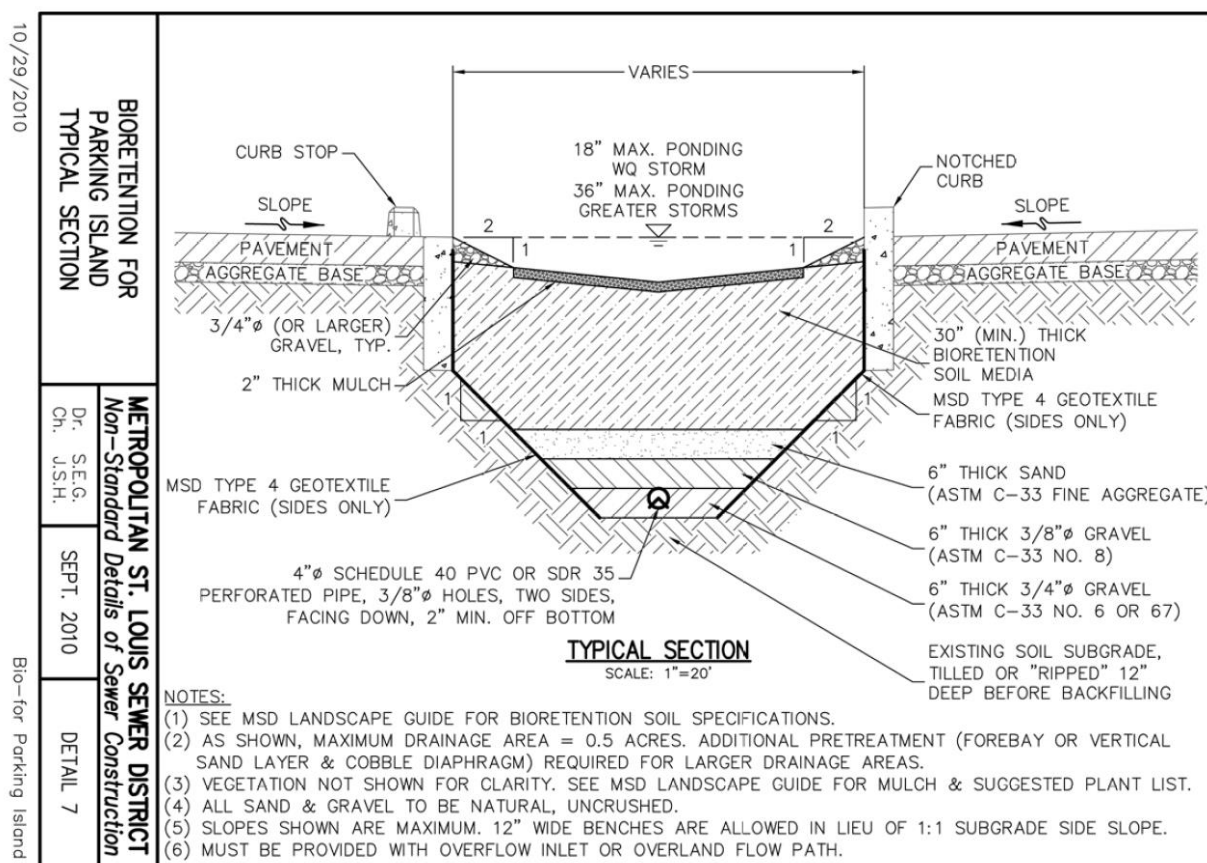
Metropolitan St. Louis Sewer District Bioretention Detail¹
